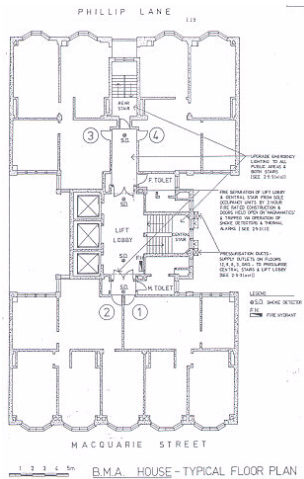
Typical floor plan of BMA House, showing principles of the fire safety system
